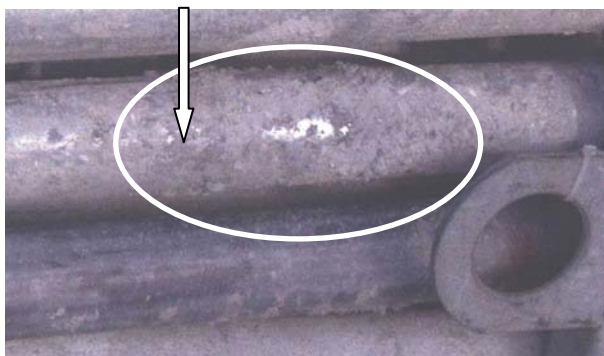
Impermissible large crusts of concrete and dent on outer tube
